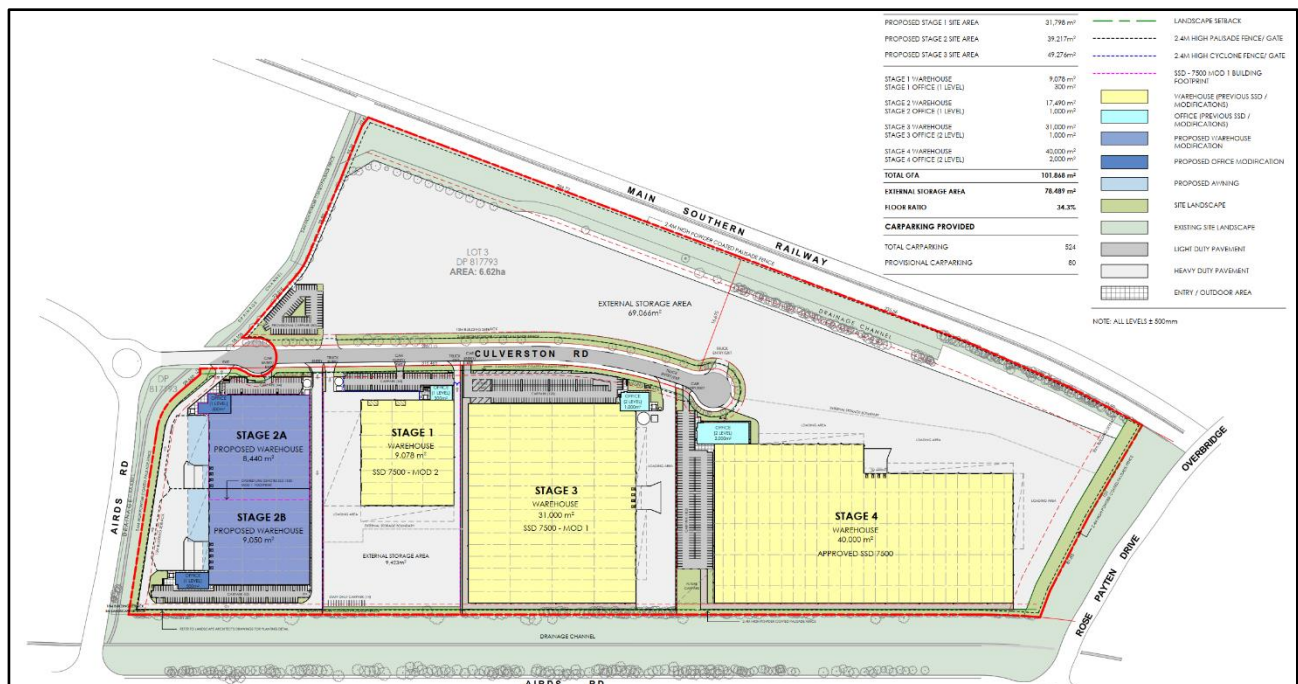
Proposed Architectural Site Plan (drawing CH2CUL – A – 04, revision D, by Watch This Space Design, dated 24/02/2022)
